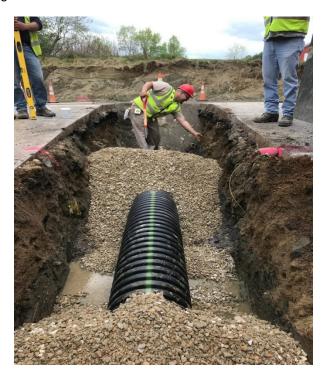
Installing 15 inch HDPE cross culvert at field inlet 2
